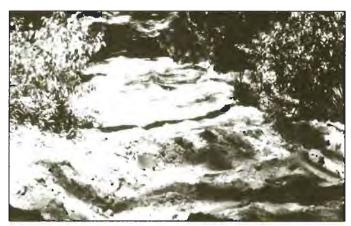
After logging, cross drains are provided on snig tracks to control runoff and prevent erosion on exposed soil surfaces.
